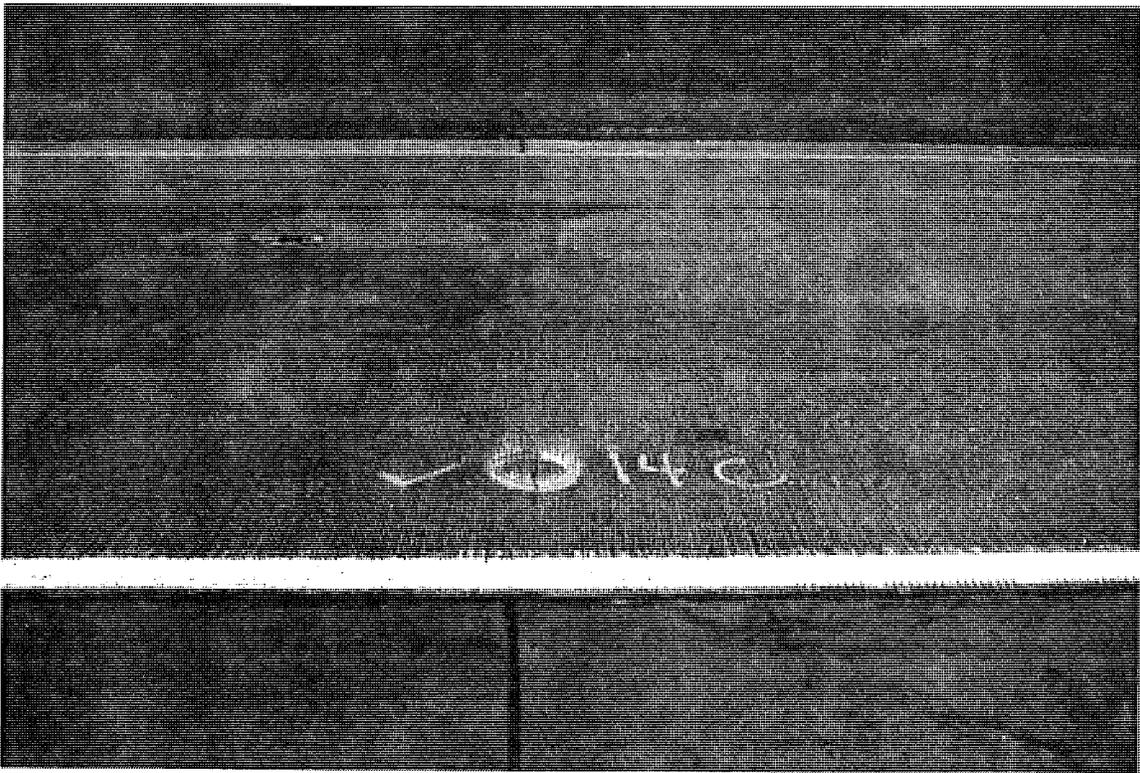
A typical transverse crack on CSN# 77024-17988A, (Section B), EB. Showing the location of core 14.
